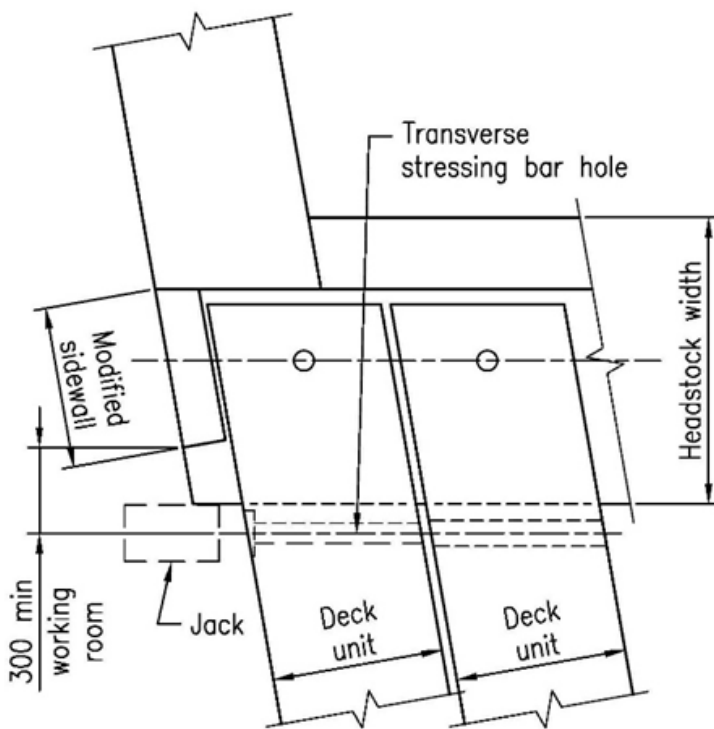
(b) – Abutment sidewall and transverse stressing jack clearance
